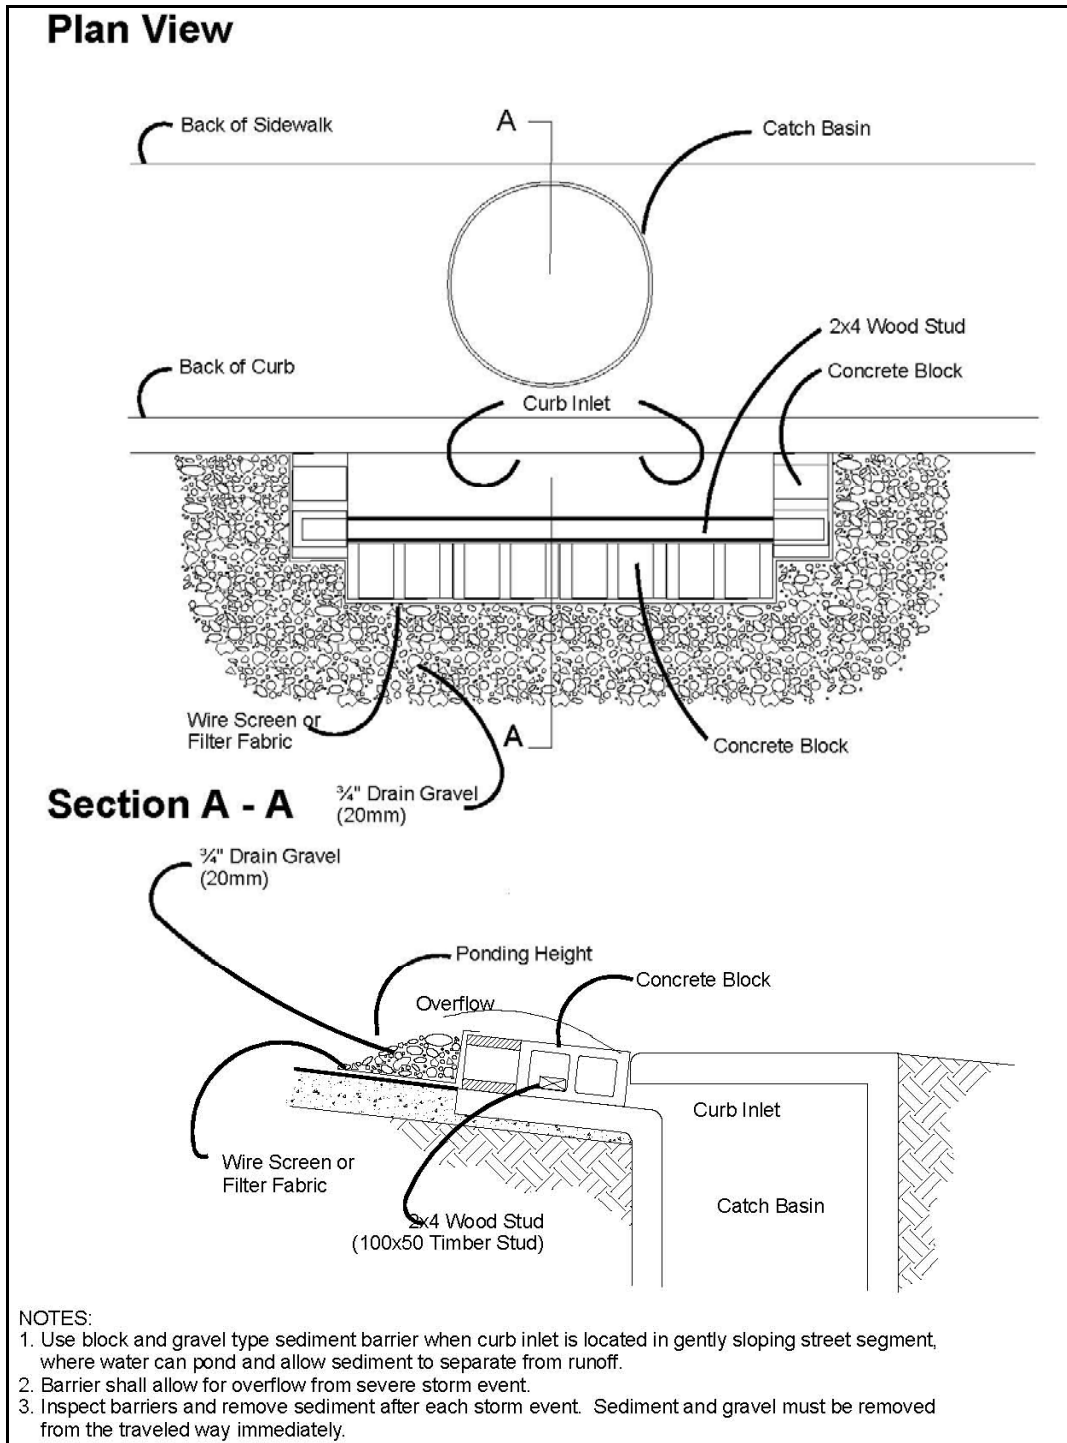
BLOCK AND GRAVEL CURB INLET PROTECTION
